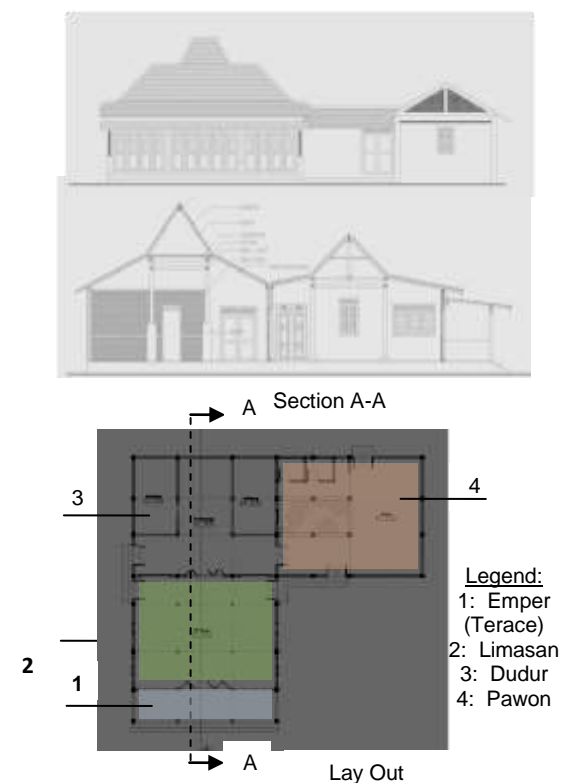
Lay Out, Section and Elevation Of Omah Dudur Siji-Limasan
